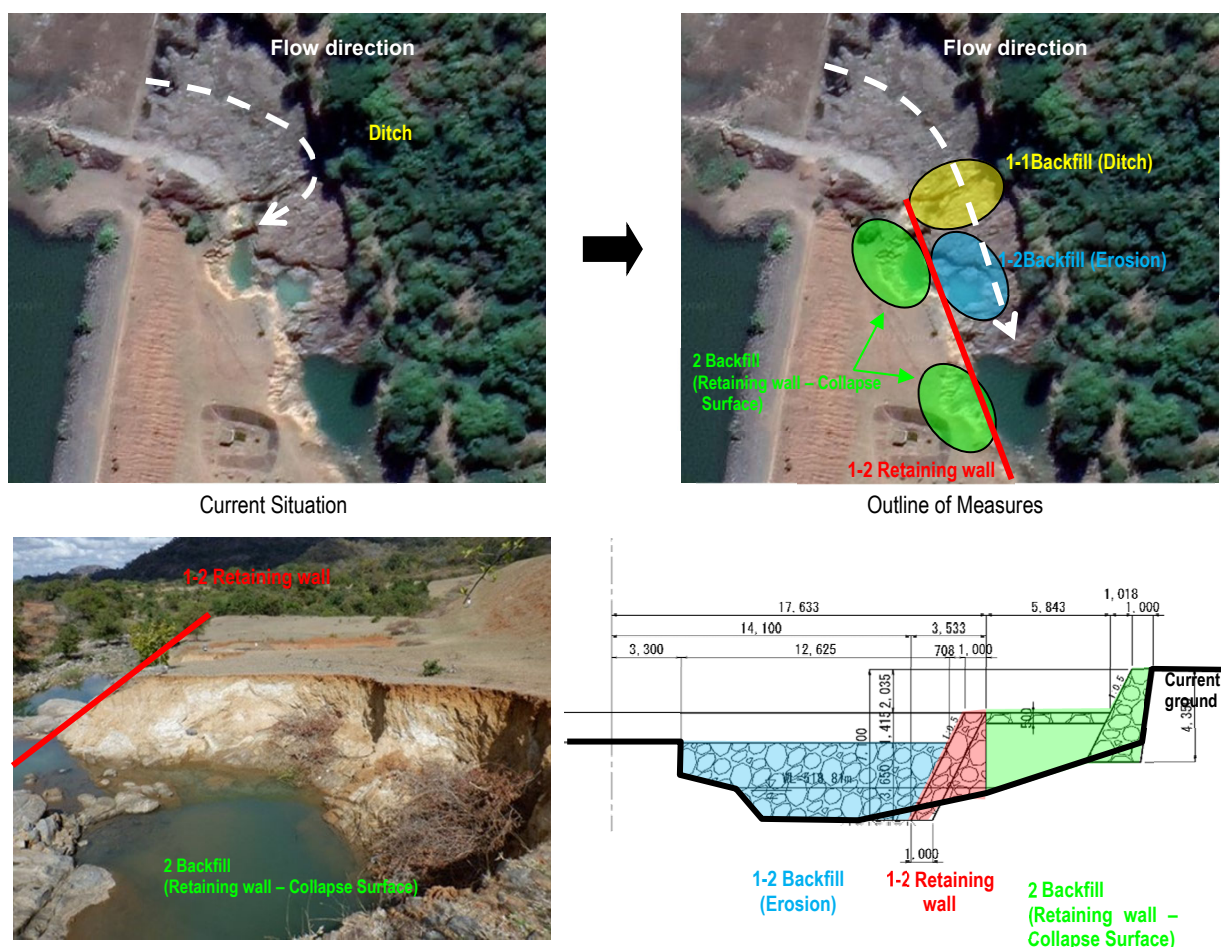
Outline of Emergency Repairing Measure for Two Large-Scale Collapses on the Right Bank Side Wall of the Connection Canal
